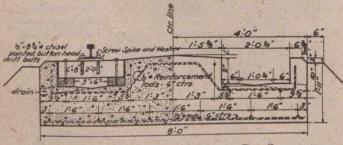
TYPE 1 OF NORTHERN PACIFIC RY. CONCRETE FOUNDATION
